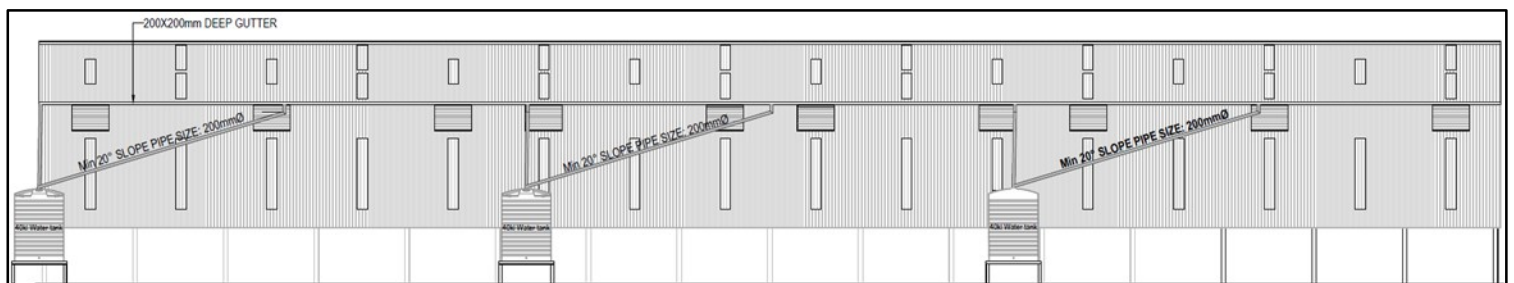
North-West elevation of building depicting the position of the required down pipes and water tanks
